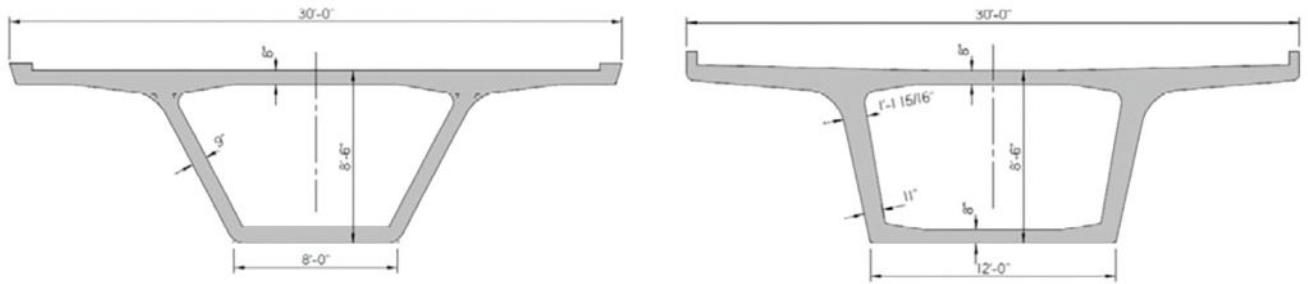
The guideway section on the left shows the optimized precast concrete segment section developed during the design-build refinements. The section on the right is the originally proposed section. The optimized section resulted in a 25% reduction in concrete. Figure: Parsons Corporation and SYSTRA International Bridge Technologies.
